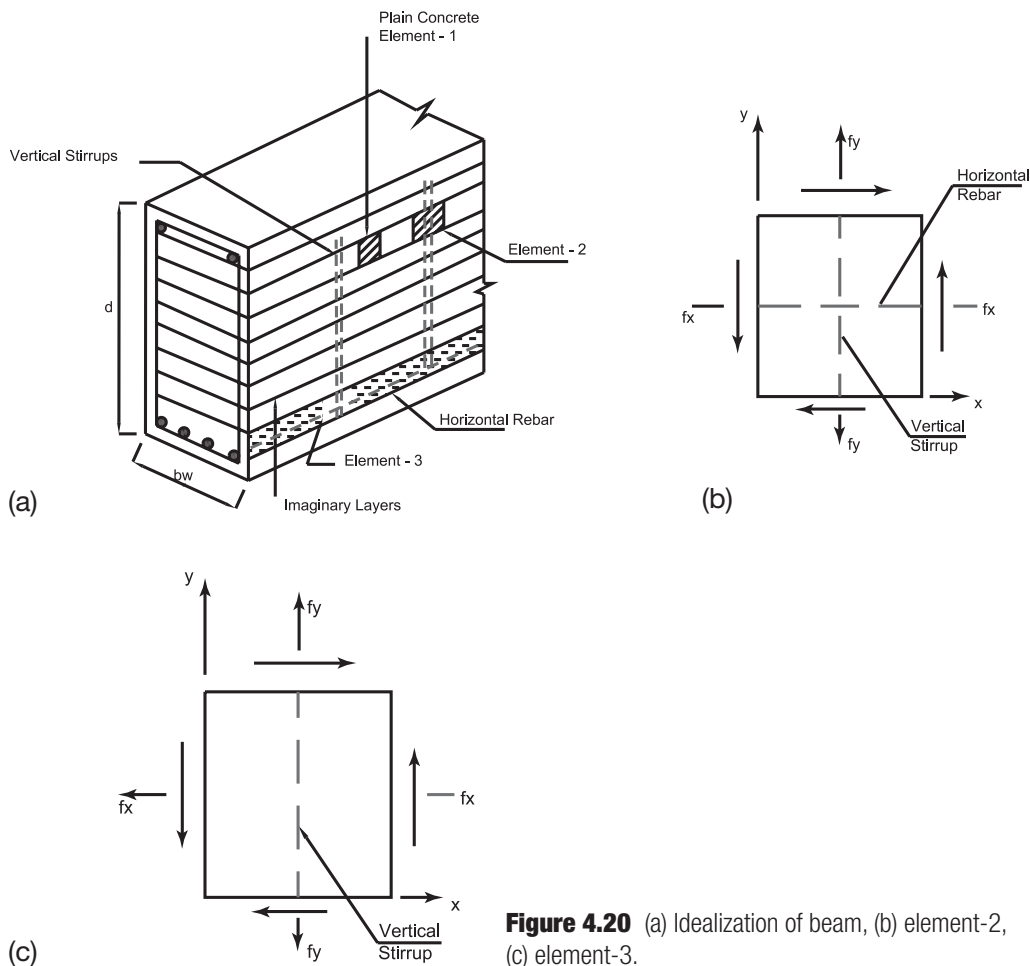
(a) Idealization of beam, (b) element-2, (c) element-3.
